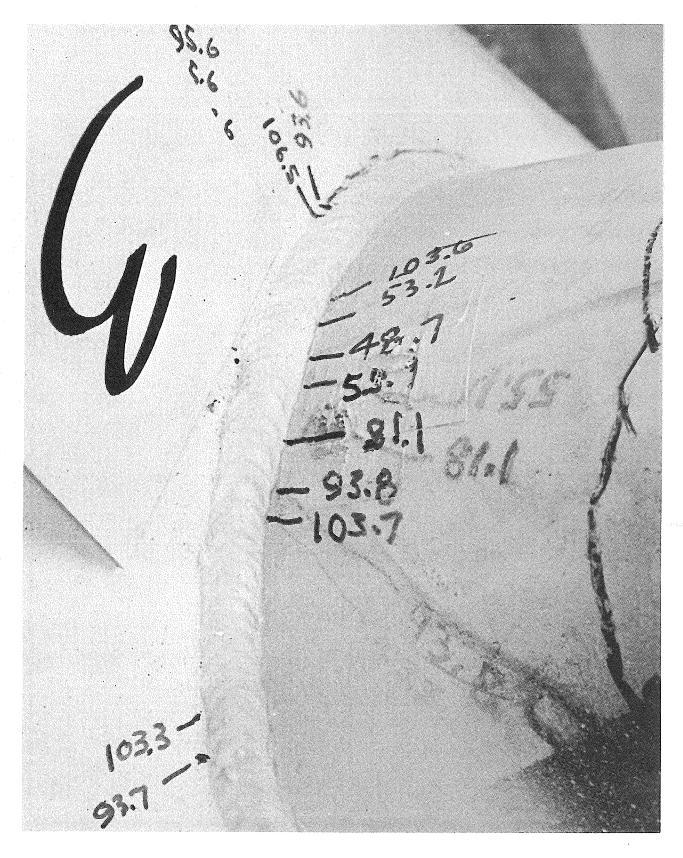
JOINT TYPE I - SPECIMEN No. 3 DETAILED CRACK PROPAGATION IN HORIZONTAL AND COLUMN MEMBER WALLS
